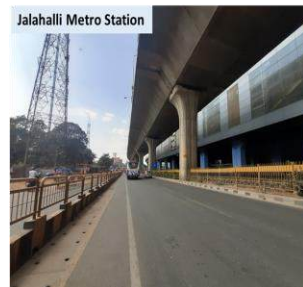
Proposed Pedestrian Skywalks at Metro Stations along the corridor
